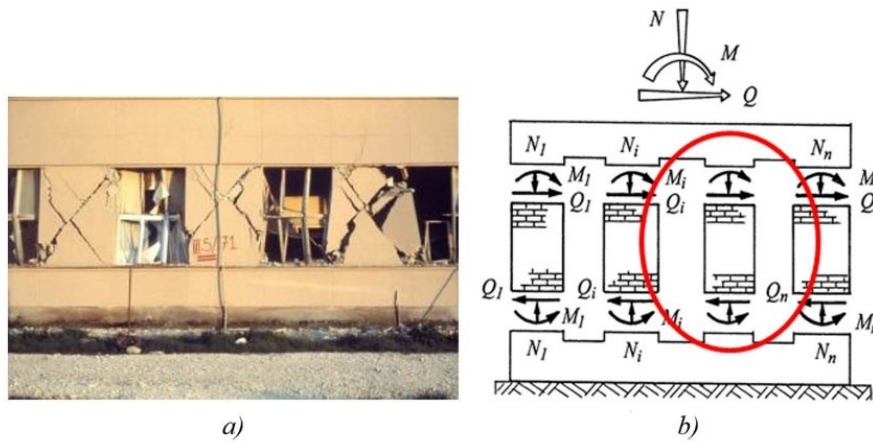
Shear mechanism. a) Failure of brick masonry piers of a school building, Montenegro earthquake, 1979 and b) Forces acting on a masonry pier during earthquake
